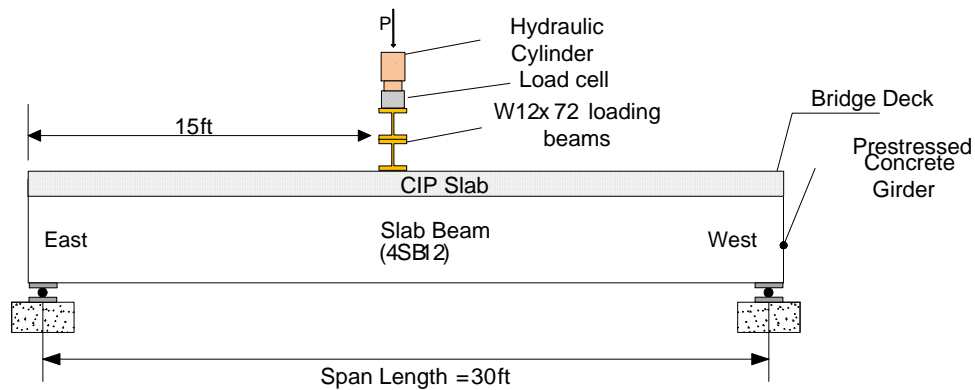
Schematic view of the slab beam test set-up (north-side view)
